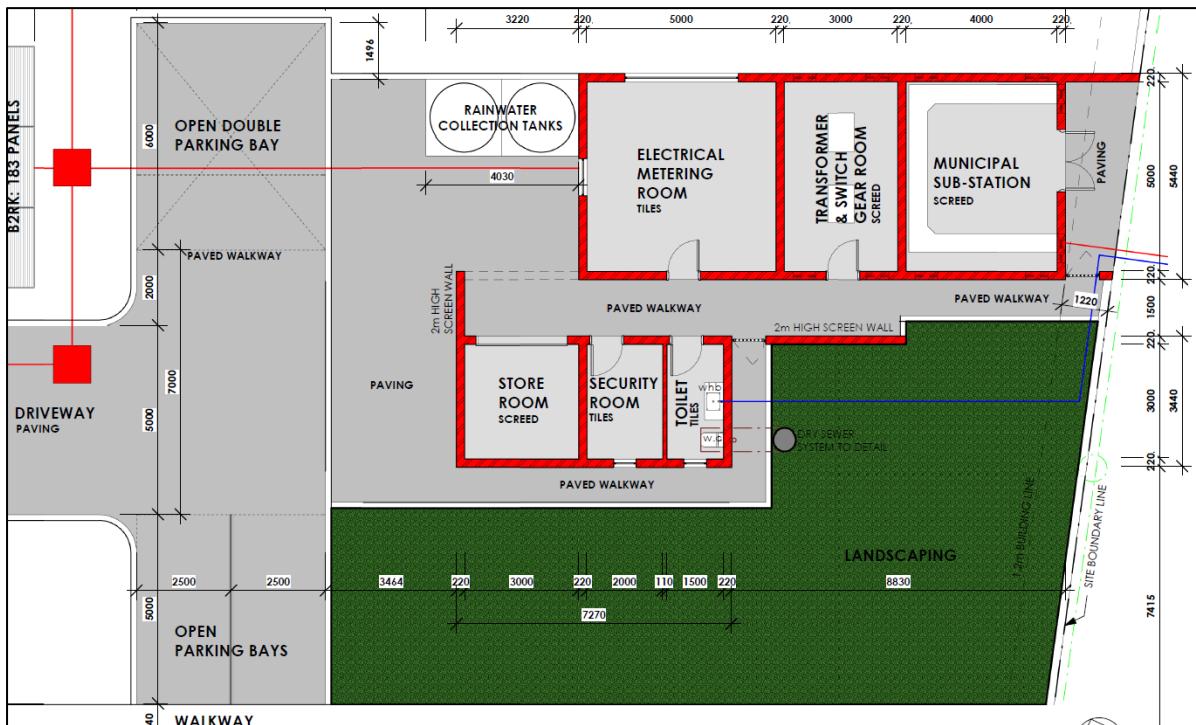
Detailed layout of the proposed buildings, substation etc.
